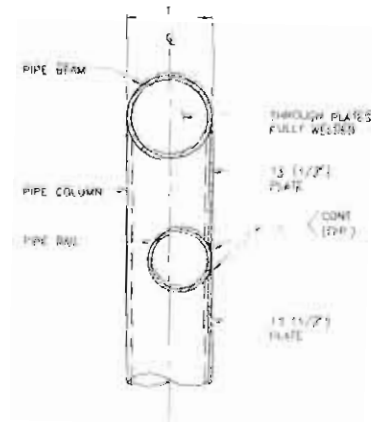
TYPICAL BARRIER DETAILS AND REINFORCING AT GRADE (II)
